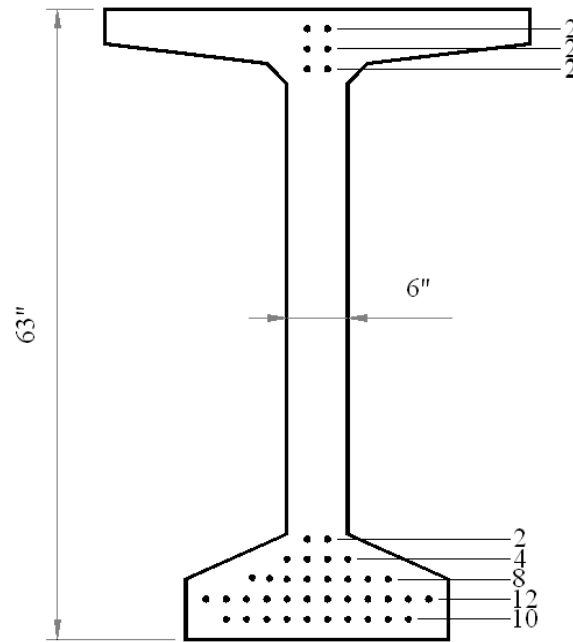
End View Cross-Section of Four BT-63 Girders with 42 - 0.6 in. (15 mm) Strands Employing UHPC.
